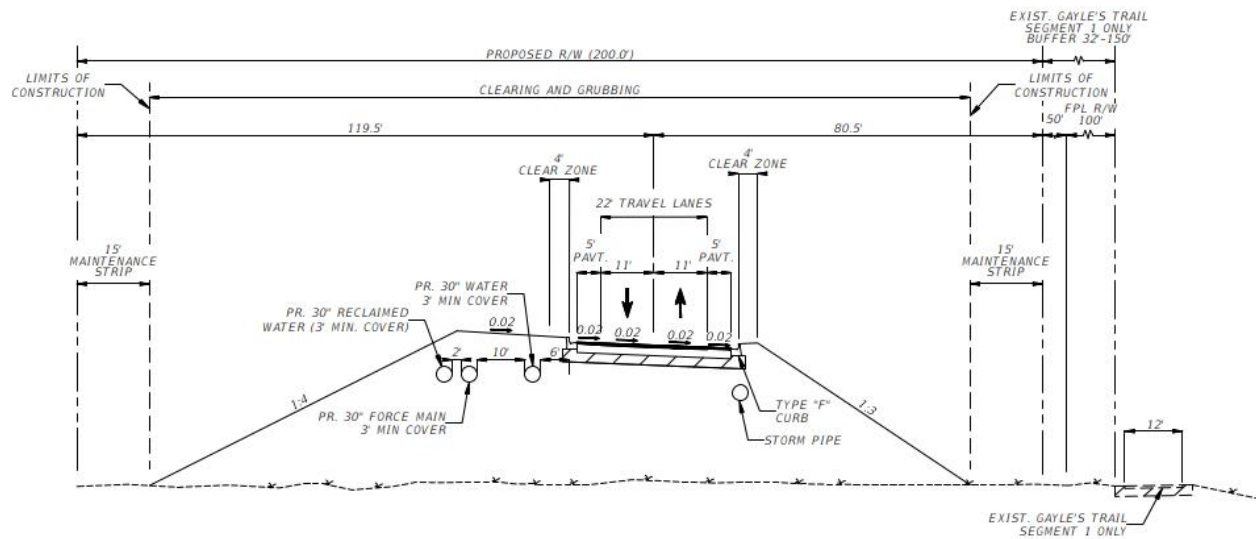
Build Alternative Typical Section, St. Joe Property Line to Alf Coleman Road
